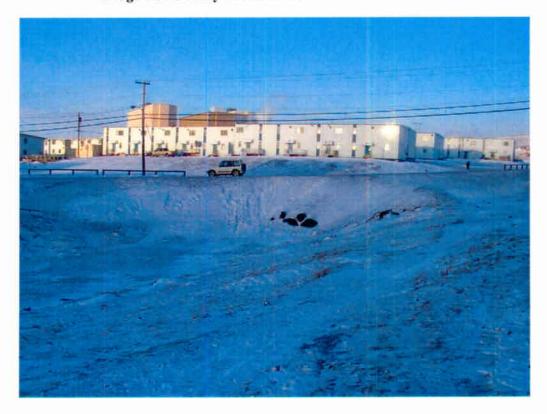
Moving further downstream to Old Riverbed, looking north, just west of UIVVAQ Road.
